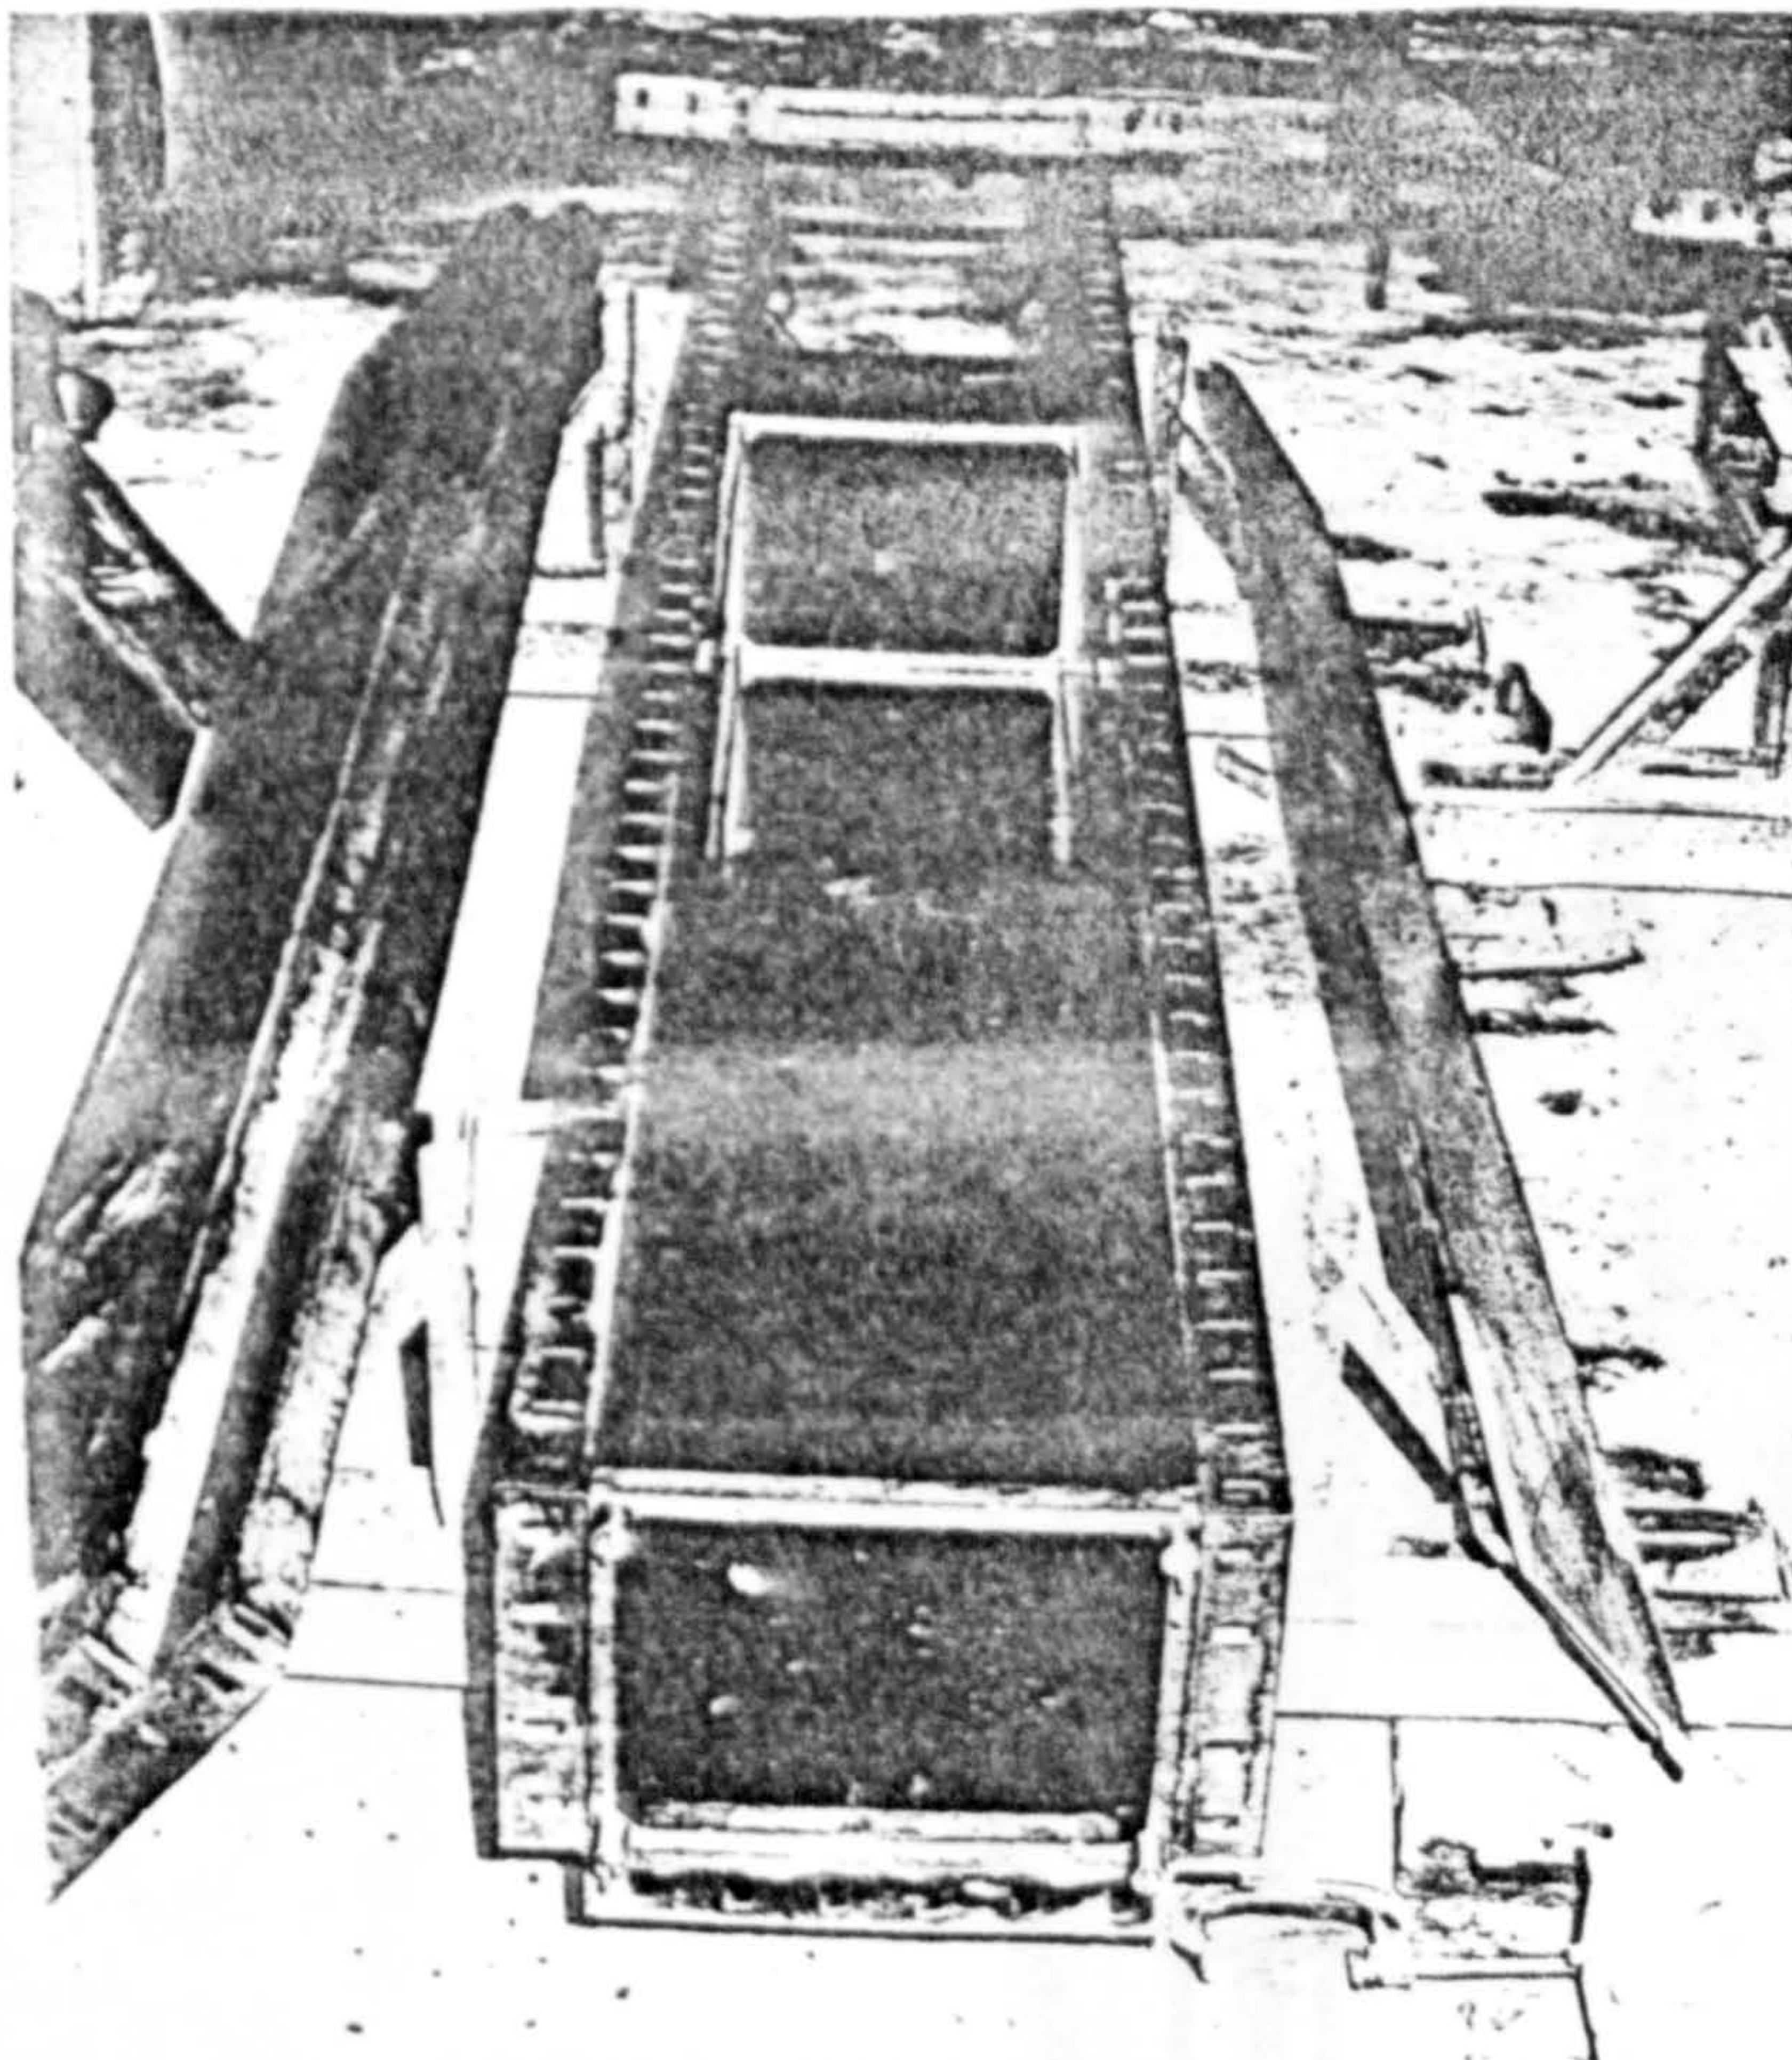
Steel Forms used for Casting Central Segment of Box Beam.
